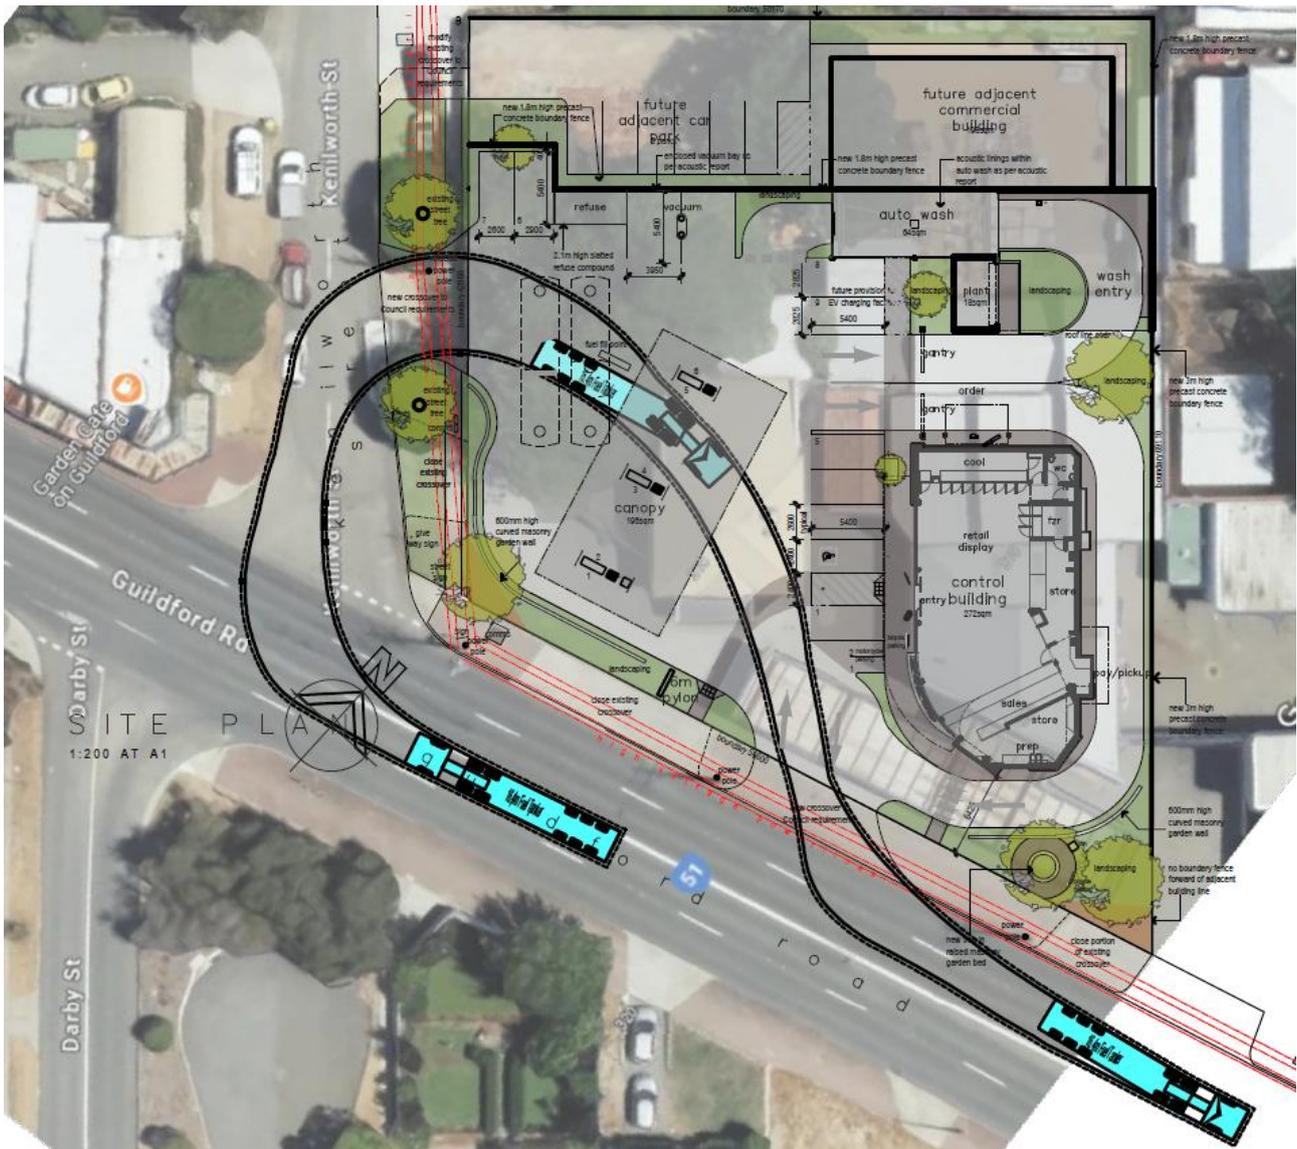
Swept path assessment 16.9 m Fuel Tanker with existing layout
